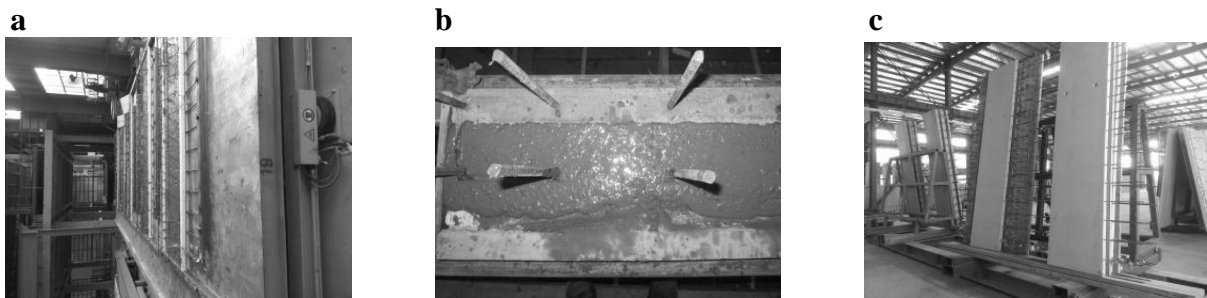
Construction steps of composite shear walls: a) 50 mm thick precast normal-concrete wall; b) composite member installation; c) cavity infilling SCC
